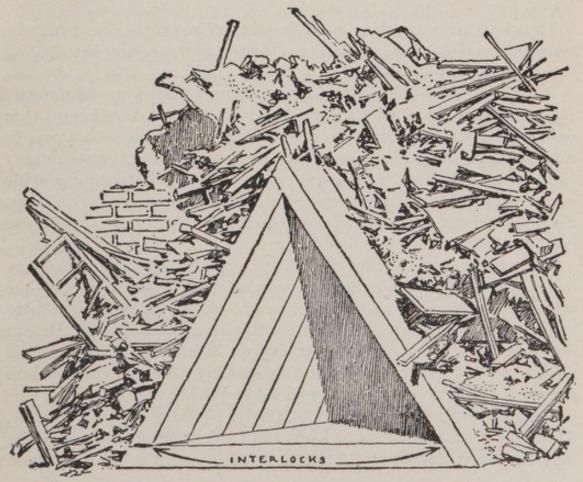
Method of timbering a debris tunnel with a triangular form of timber lining.
